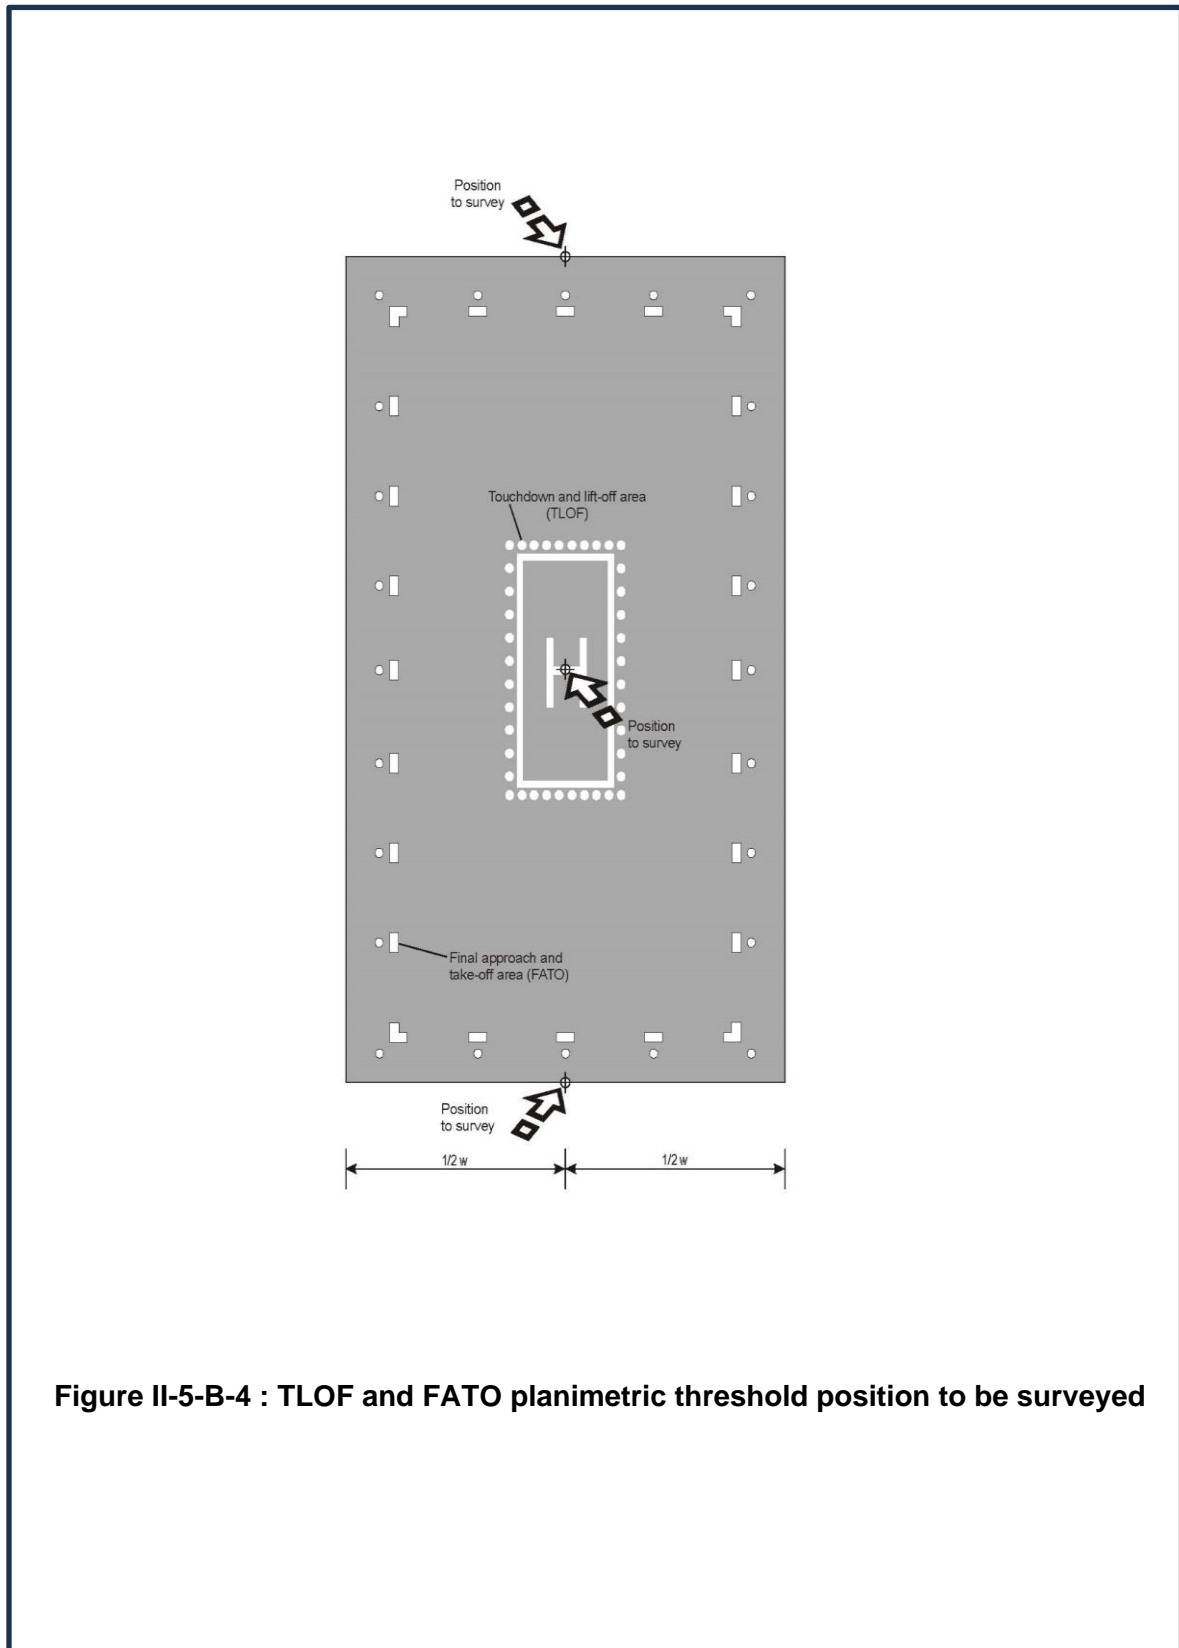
B-4 : TLOF and FATO planimetric threshold position to be surveyed
